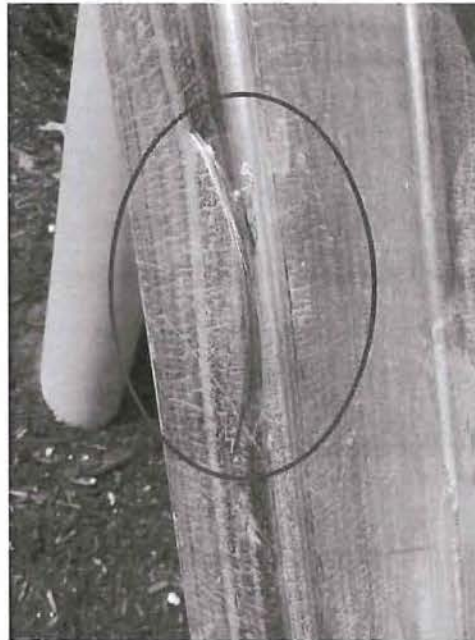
Building 3, Damaged truss after impact with bollard
